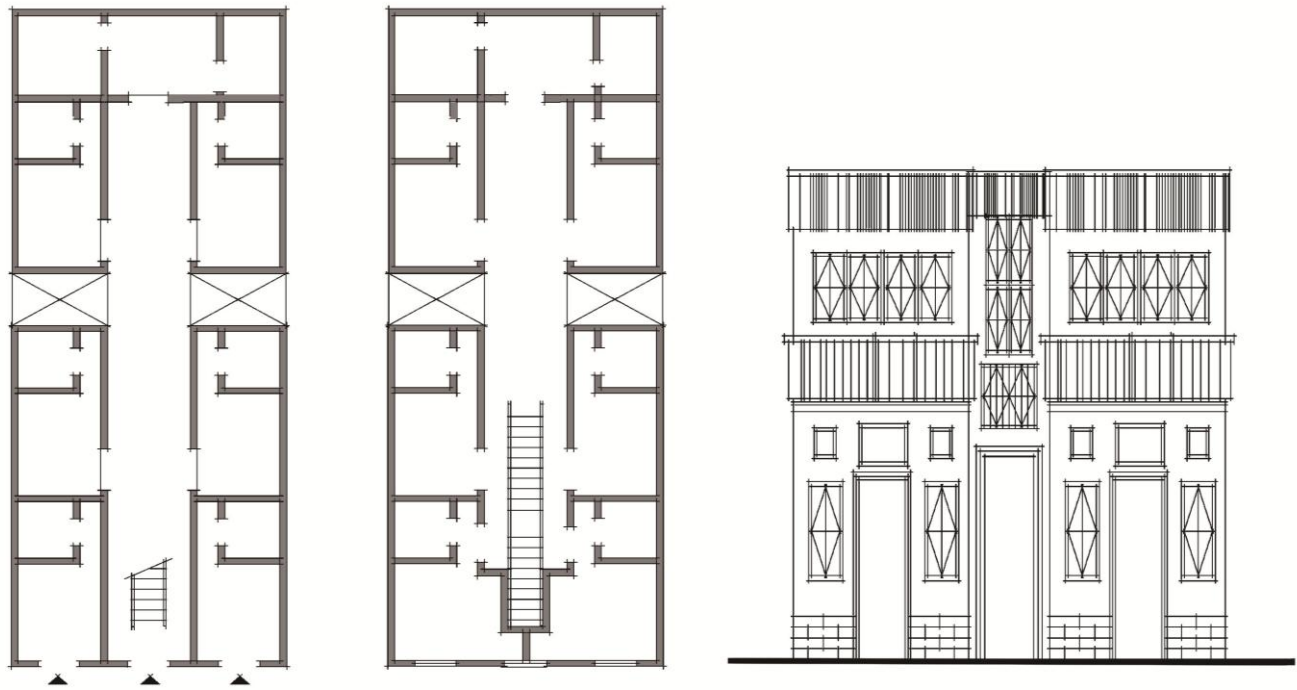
A sample floor plan and façade of the *Doubling zhutongwu apartment
